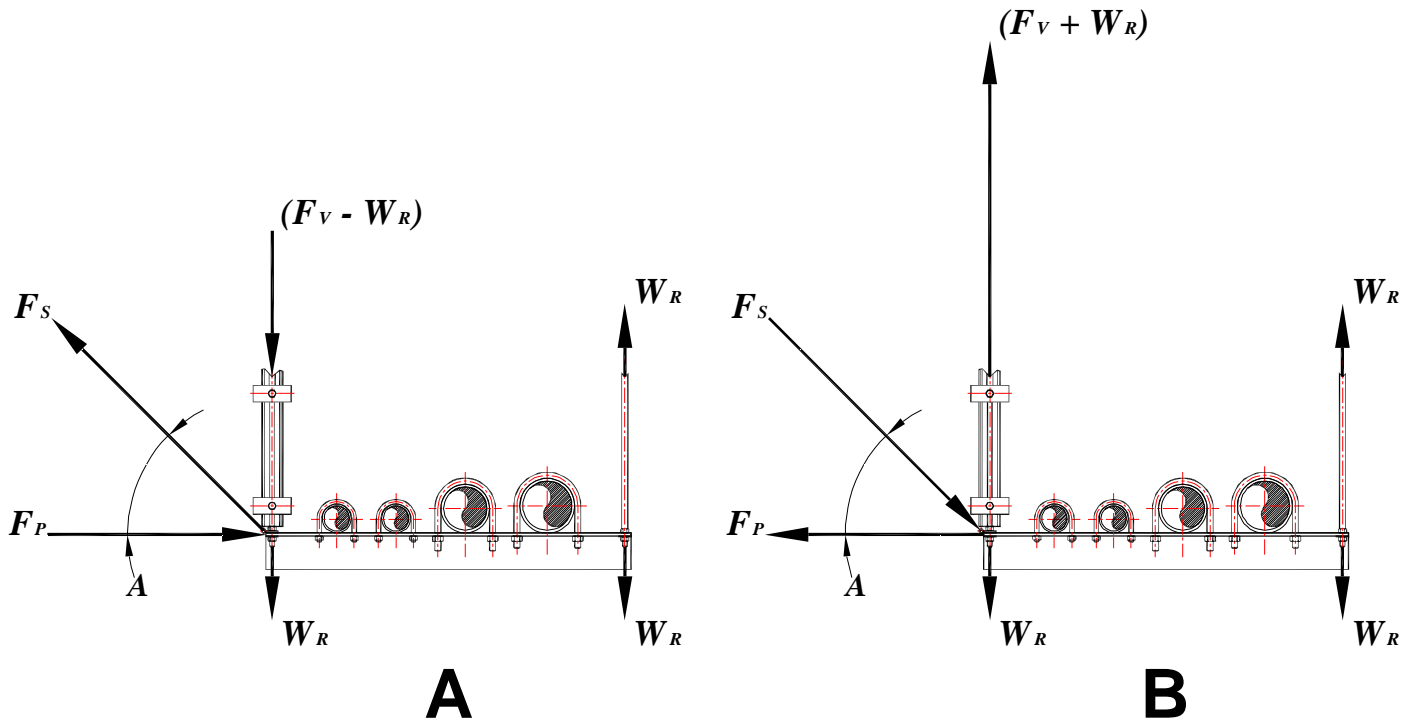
; Forces Acting on a Strut Restrained Trapeze Supported Pipe or Duct
